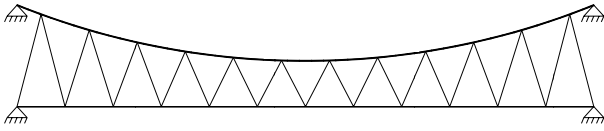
Suspension bridge stabilization by application of diagonal suspenders
